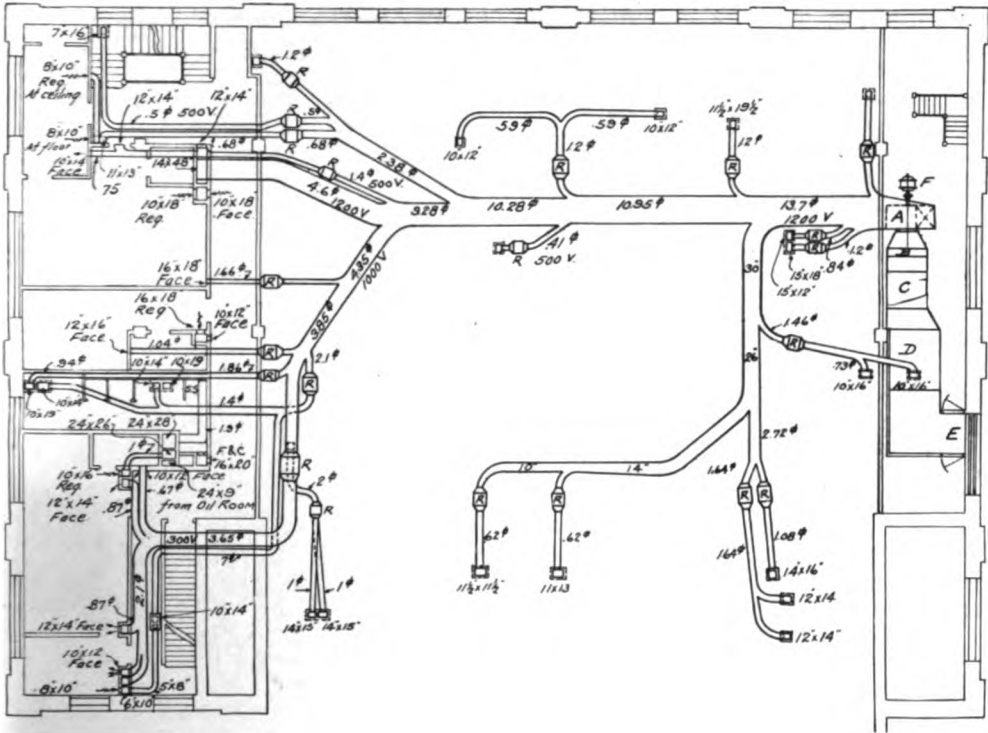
PLAN OF AIR PIPING IN OFFICE BUILDING OF HYDRAULIC POWER CO.,
